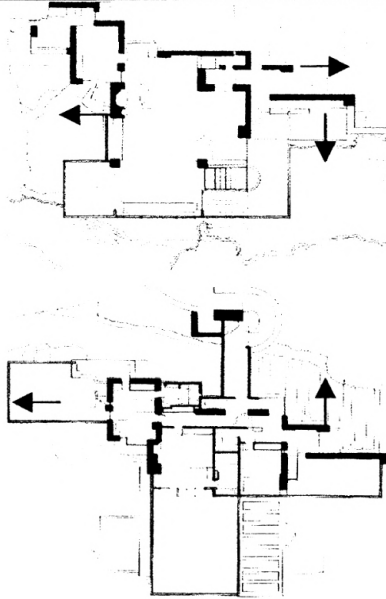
Interpenetration. Fallingwater's projecting trellis over the driveway, west terrace, plunge pool, boulder at fireplace, and horizontal entrance wall all tie the house to the natural landscape. (Kaufmann, 1986, p. 73, 135).
